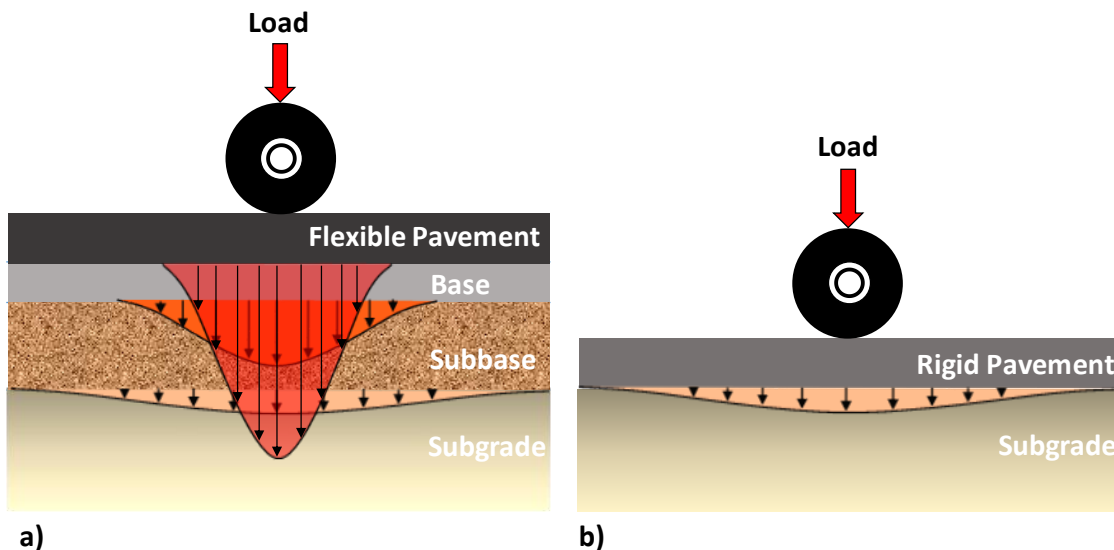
Stresses at various layers a) Flexible asphalt pavement and (b) rigid concrete pavement
